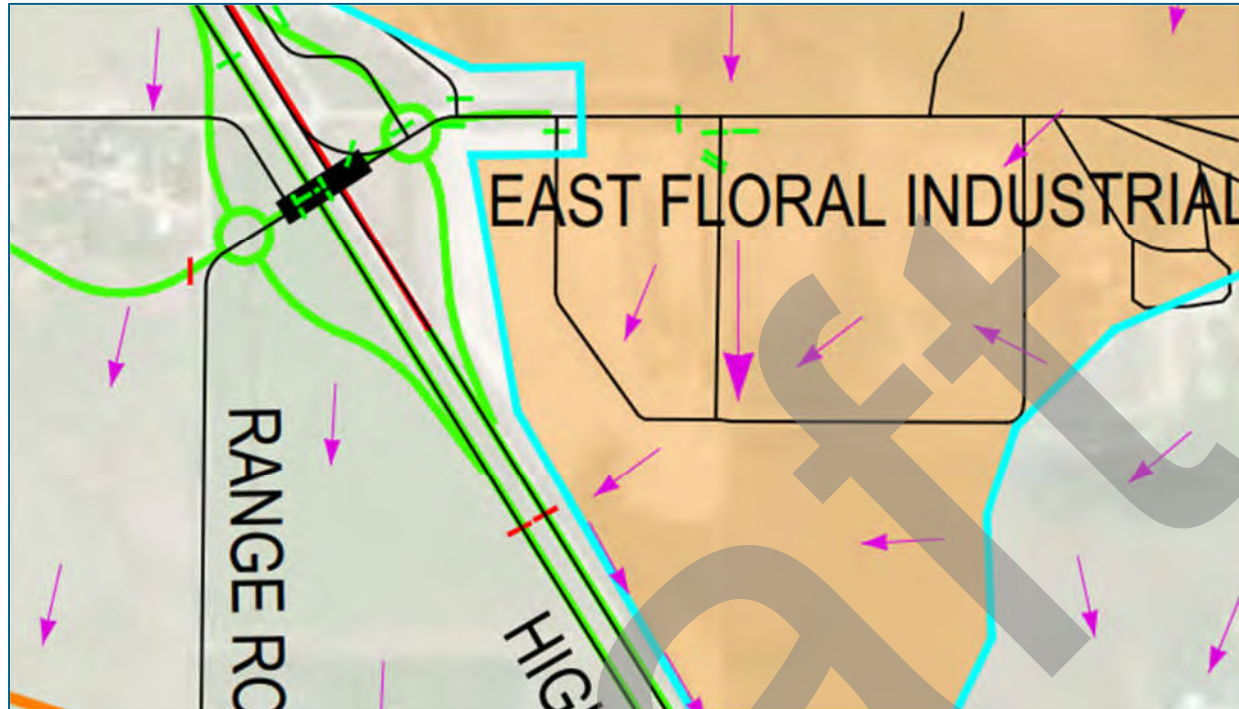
Potential exception to maintaining existing drainage – Highway 16 at Floral Road (from Figure 5.28)
